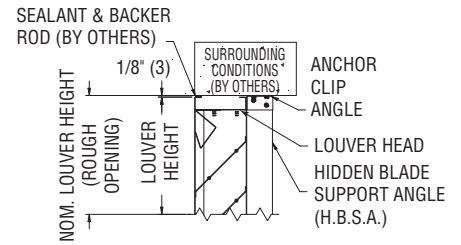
B - LOUVER HEAD WITH BLADE SUPPORT ANGLE (IF REQUIRED)
